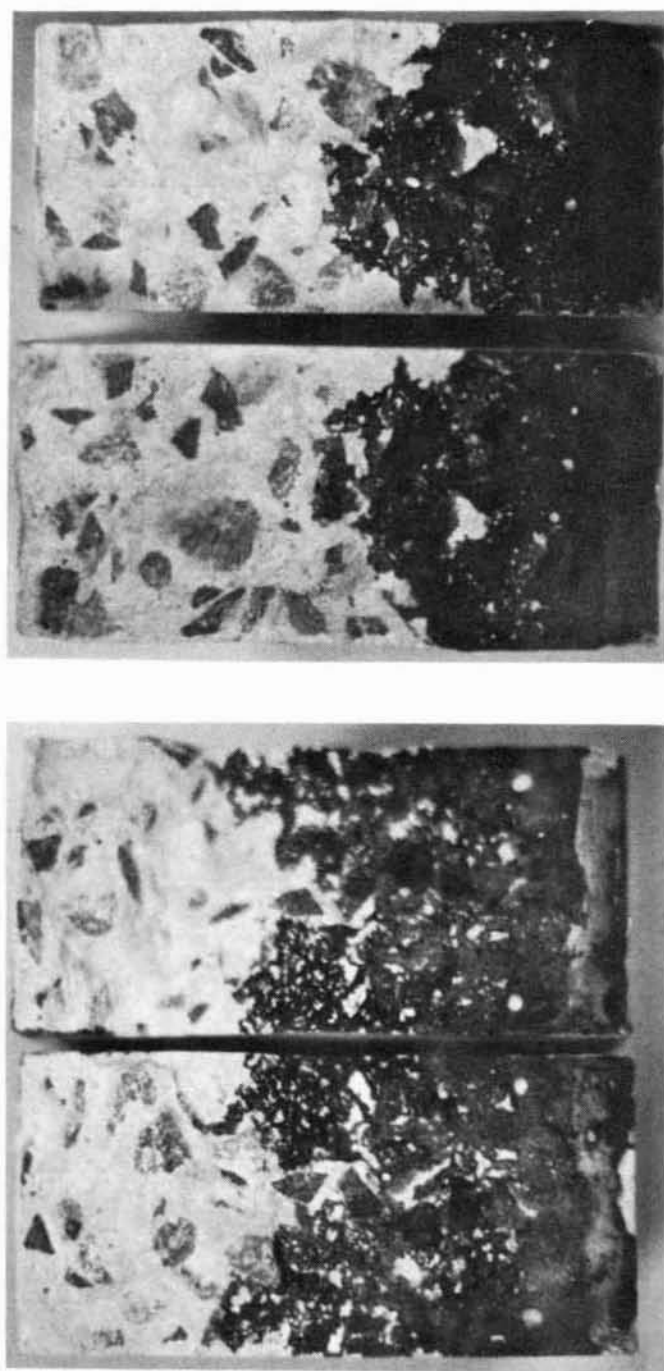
Dyed Fracture Surfaces.
